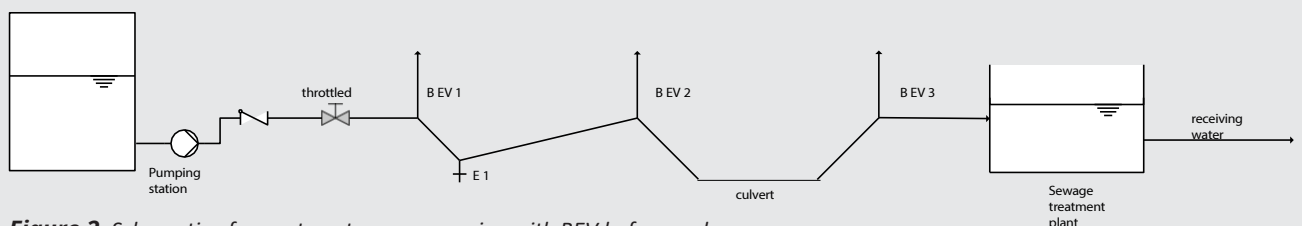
Schematic of a wastewater pressure pipe with BEV before and after culvert
